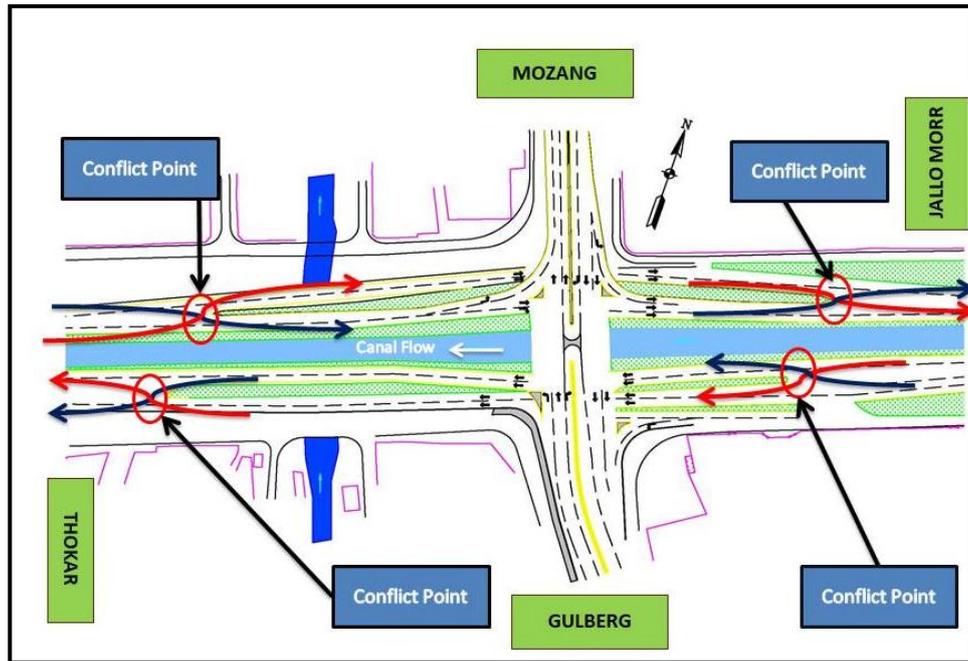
Traffic Weaving Phenomenon at Jail Road Underpass
